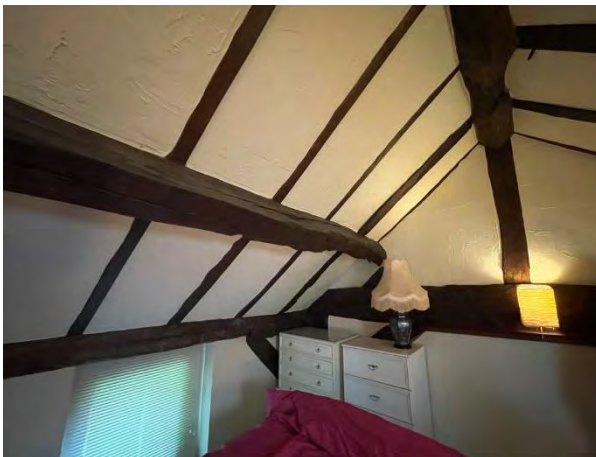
Roof structure above the southern end of the byre, facing northwest; note the brace
